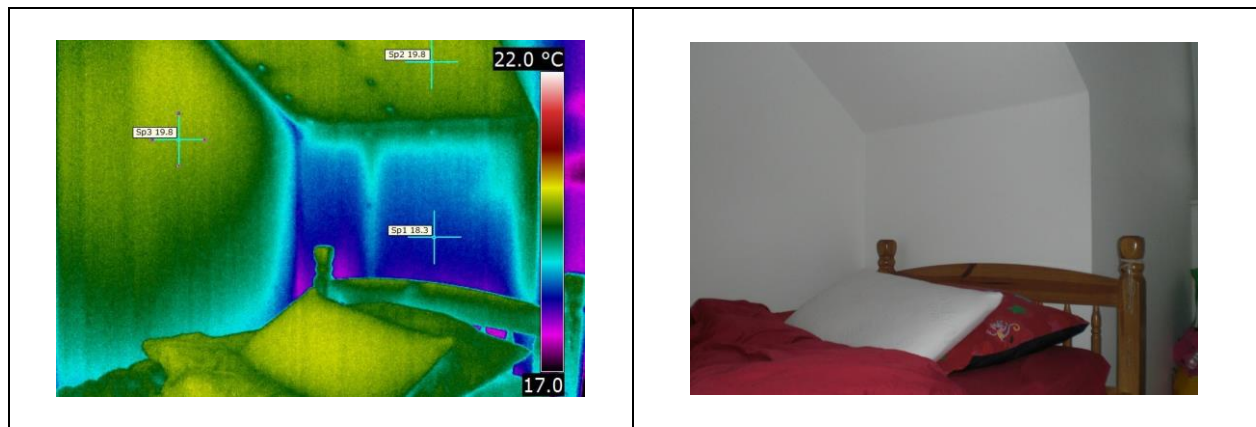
(Left) Top floor front bedroom wall thermogram. Note: Area of reduced temperature behind bed is likely to be due to poor fitting of insulation within the wall / ceiling construction. A similar finding was also identified in other top floor walls. (Right) Top floor front bedroom wall digital photograph.
